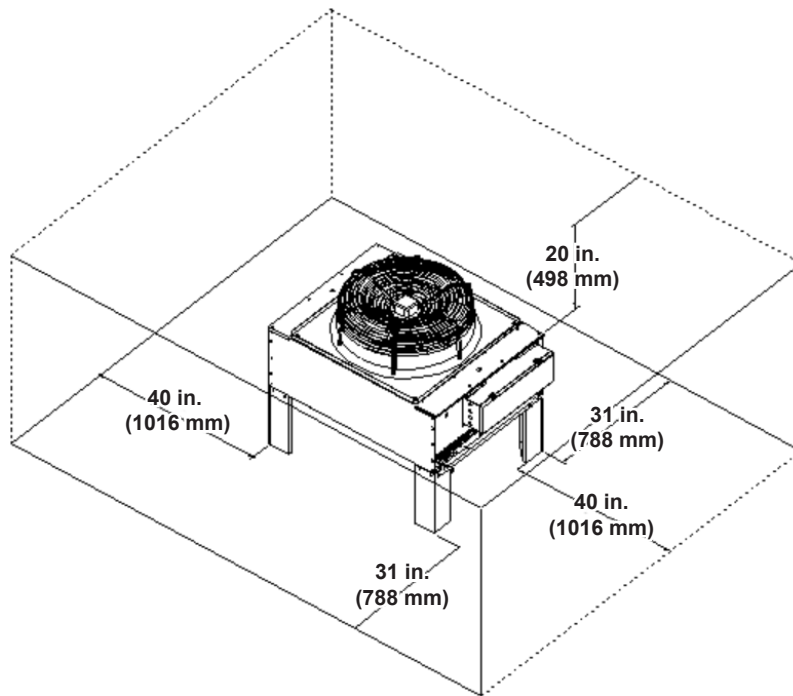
B: Installation Clearance Requirements – Condenser (SRCOOLDXRW25)
